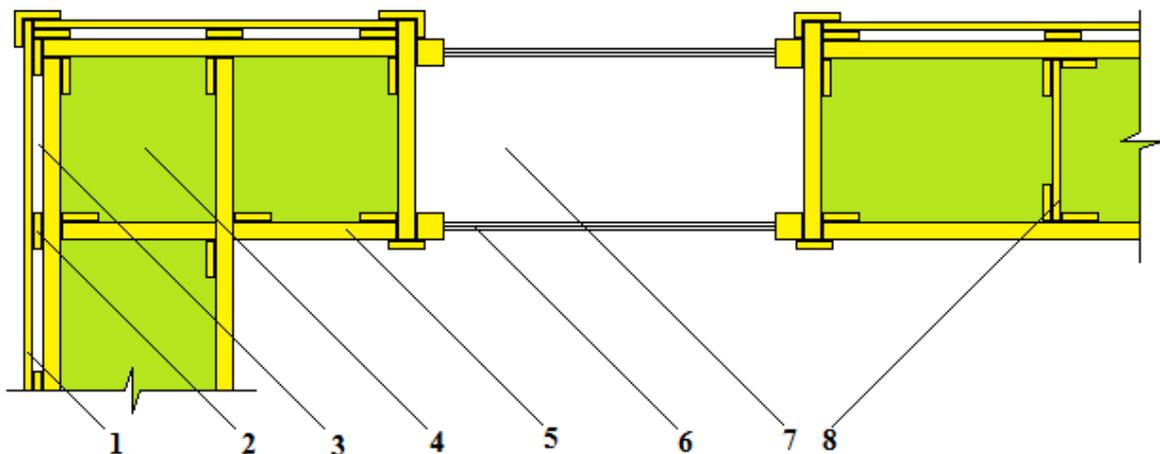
Wood wall construction with filling heat insulation material: 1 – thin wood boards facade for ventilation; 2 – vertical boards; 3 – ventilated facade gap; 4 – filling material of heat insulation; 5 –bearding construction of thick wooden boards; 6 – double windows and/or doors; 7 – air camera for heat insulation; 8 – knob type of wall width fitting
